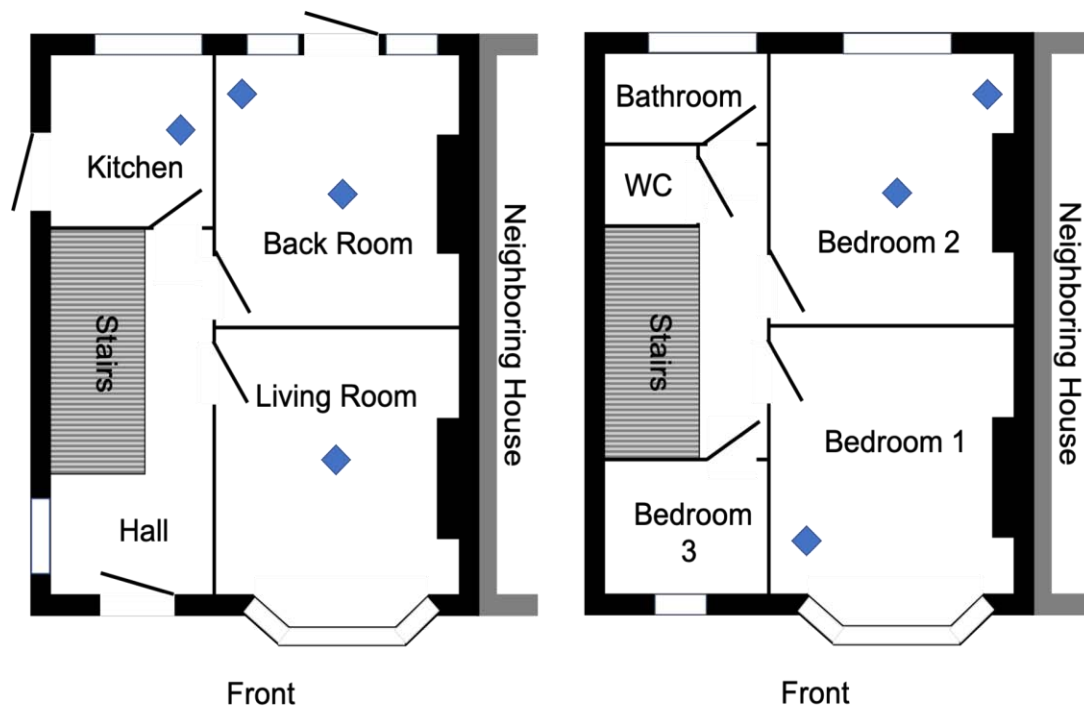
Layout of the test dwelling, ground floor on the left hand side, first floor on the right hand side. The CO₂ sensors are indicated by the blue diamonds. The single room tests took place in the downstairs 'back room'.
